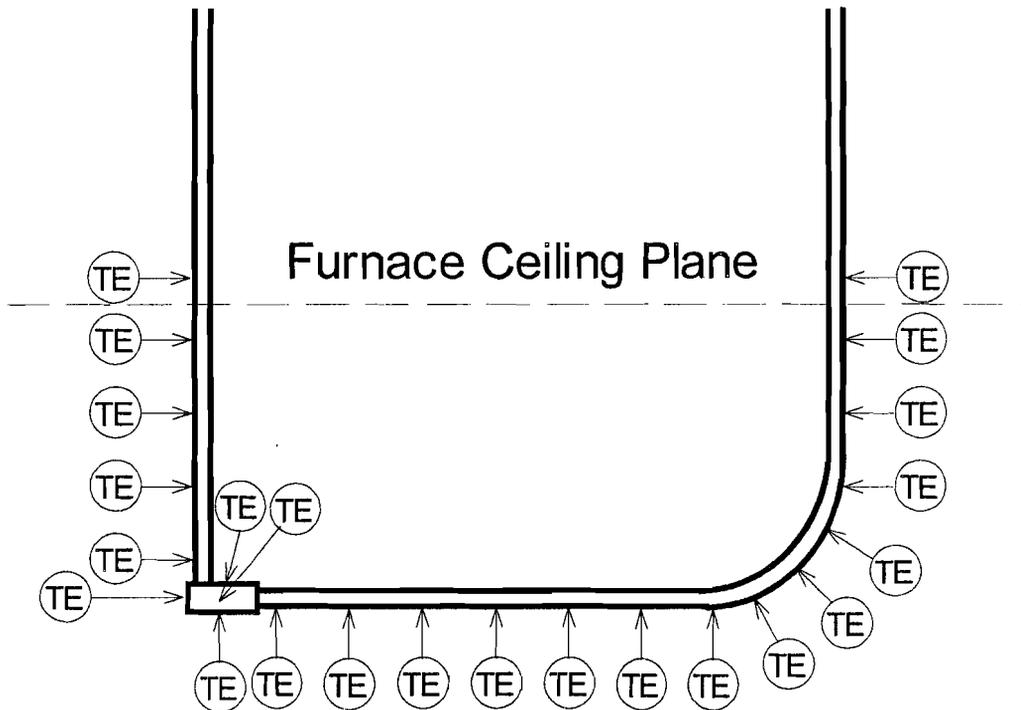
Planned Thermocouple Locations on 27-mm (1 in.) Conduit/Condolet LB Test Specimens. Note that at least one thermocouple will be attached to each face of the condolet fitting. A single bare copper wire (8 AWG) will be instrumented with thermocouples and routed inside the test specimen.
